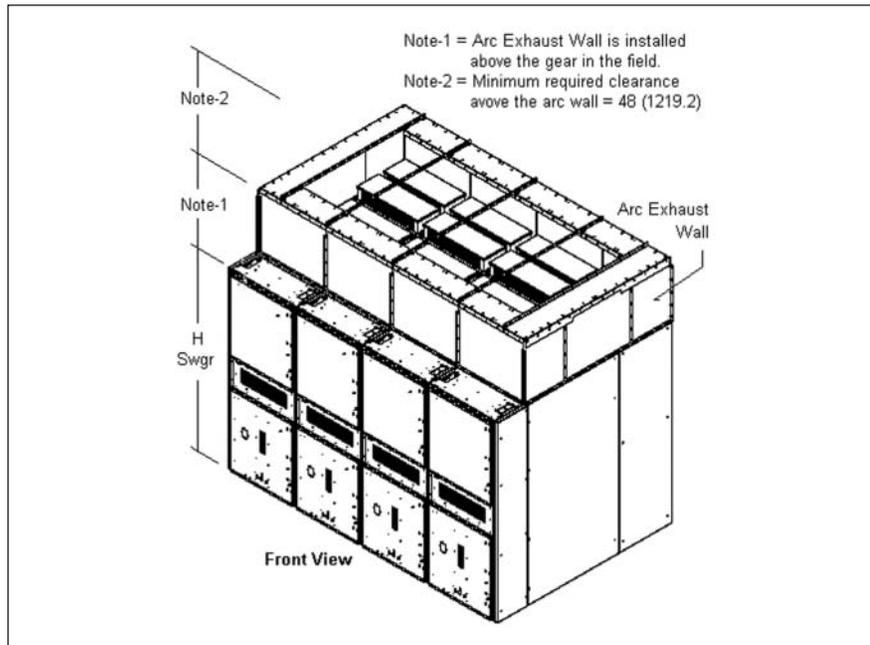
Arc Exhaust Wall Above the Switchgear
